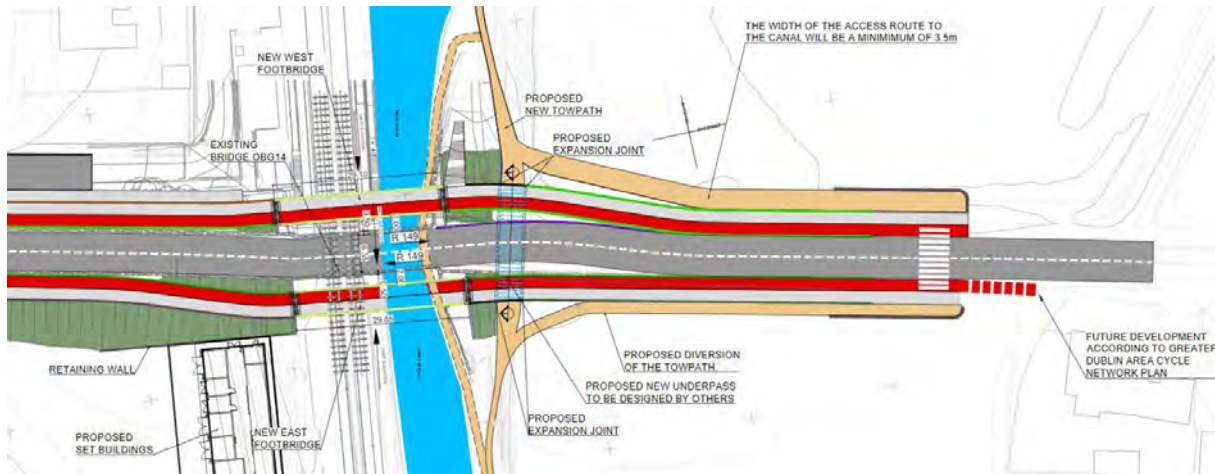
Plan of proposed footbridges to east and west of OBG14
